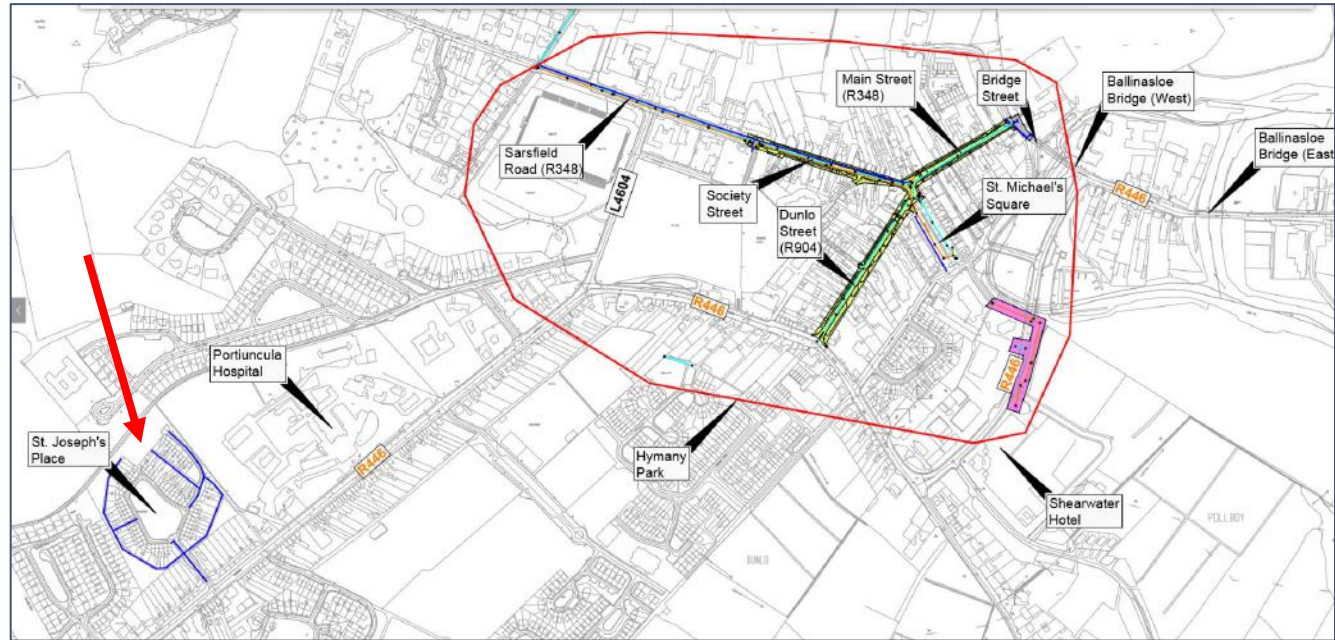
Site Layout Plan showing location of St. Josephs Place
